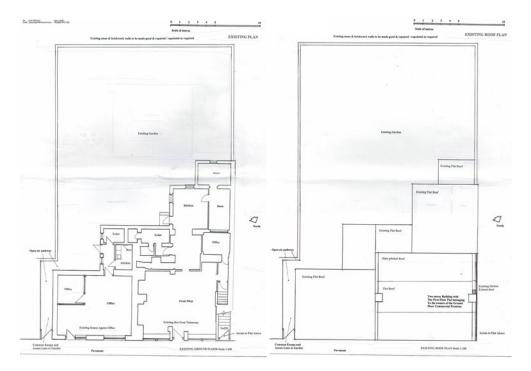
Existing ground floor plan (left) and first-floor plan (right)
